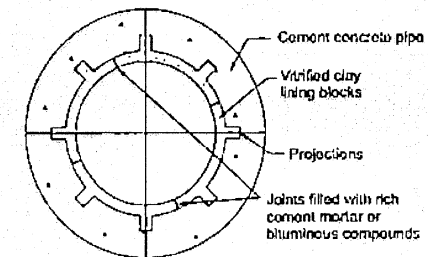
Cement concrete pipe, lined inside with vitrified clay lining
